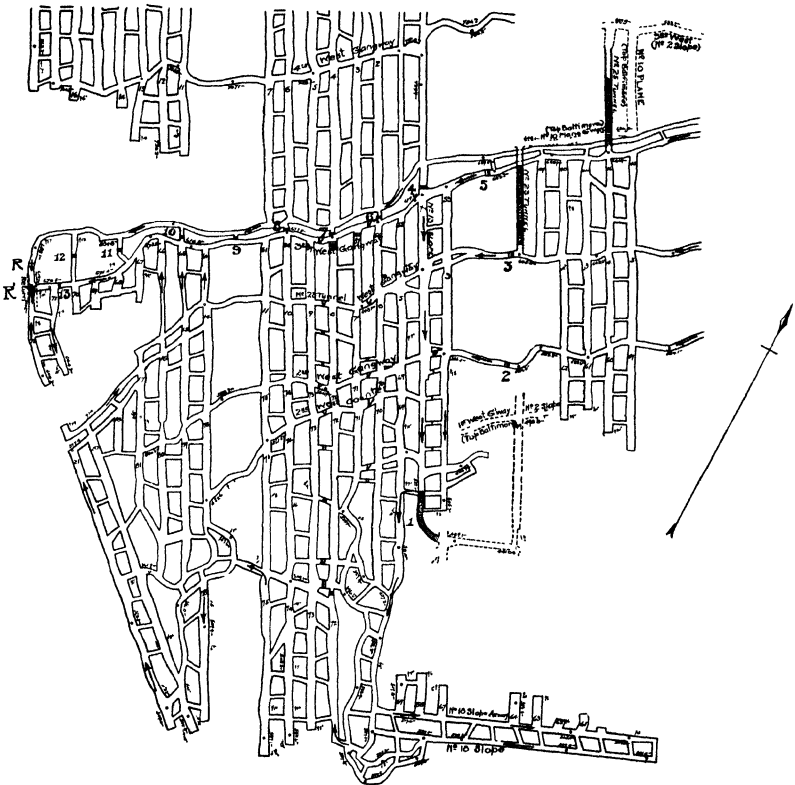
PLAN SHOWING LOCATION OF FIRE AND MINE WORKINGS INVOLVED, SOUTH WILKES-BARRE No. 5 COLLIERY.
